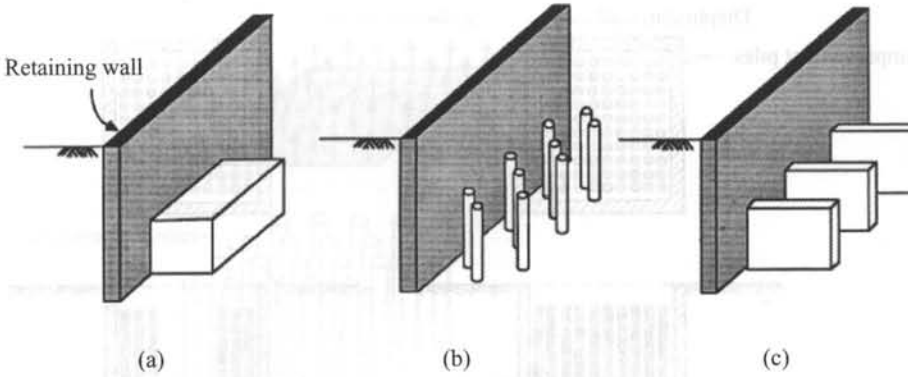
Typical arrangement of soil improvement in excavations: (a) block type, (b) column type, (c) wall type.
